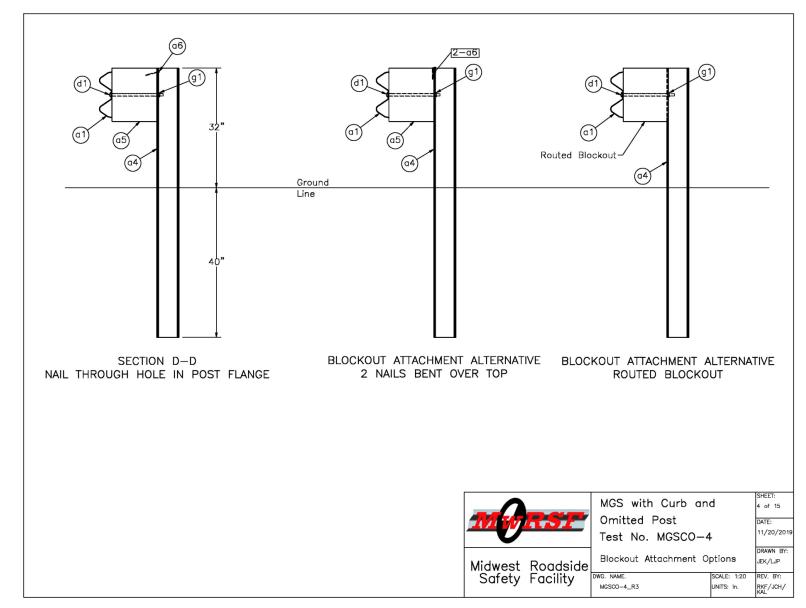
Blockout Attachment Details, Test No. MGSCO-4
